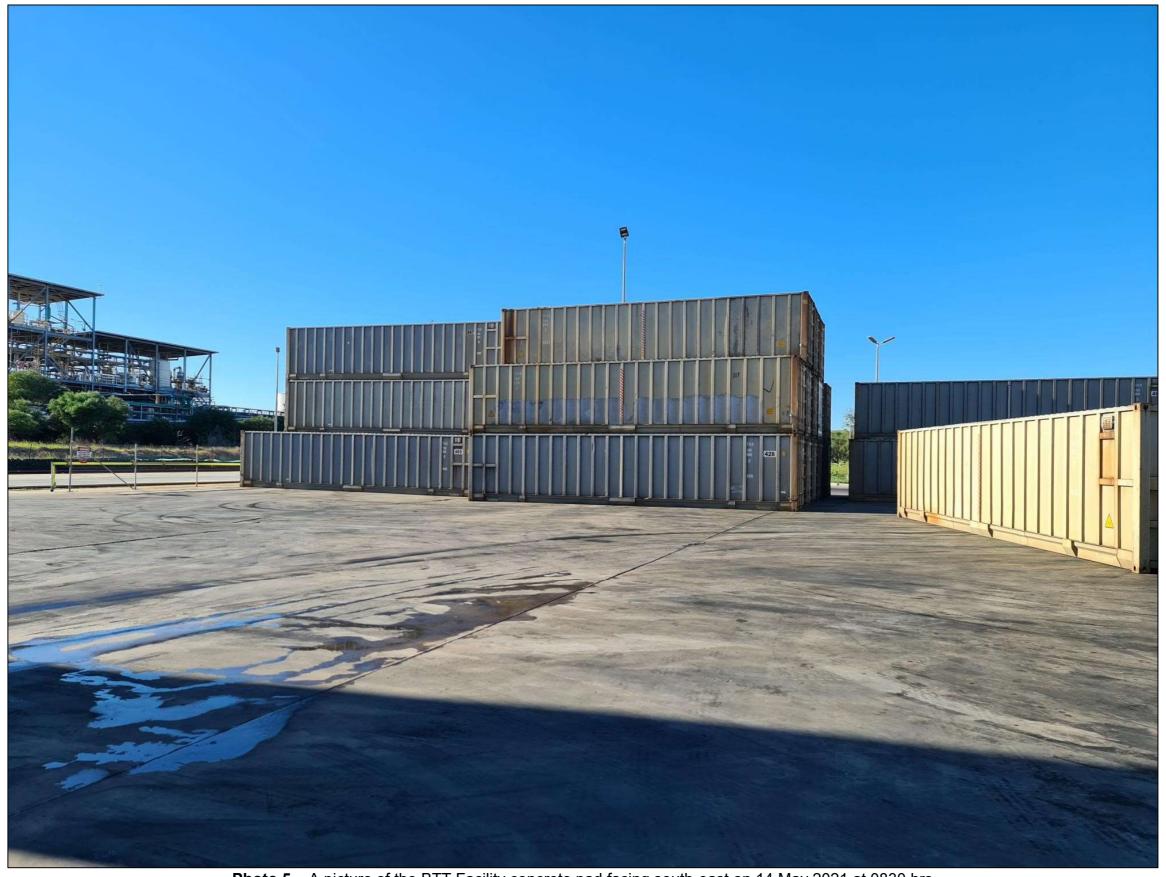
A picture of the BTT Facility concrete pad facing south-east on 14 May 2021 at 0830 hrs
